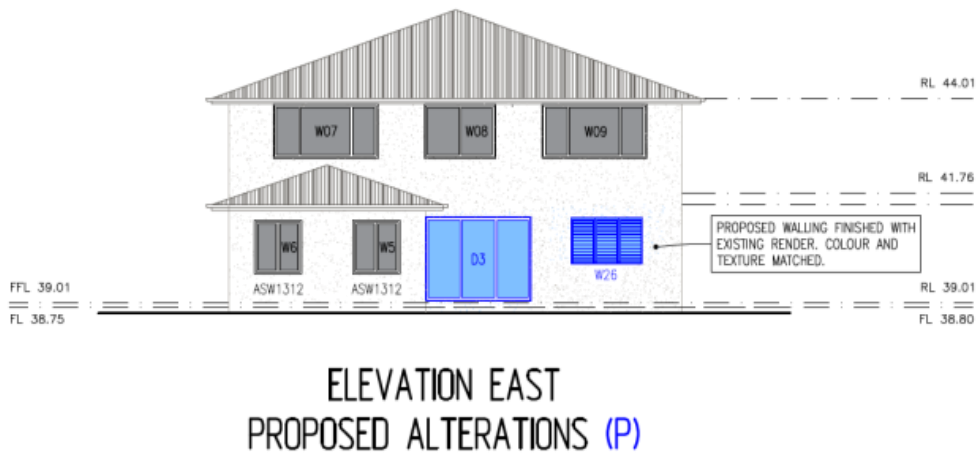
The proposed east elevation with proposed kitchen walling integrated with the existing dwelling and a new louvre window to enhance natural ventilation in the proposed kitchen. Note: the dwelling, viewed from the east, remains substantially the same development as originally approved under DA-866/2022.
